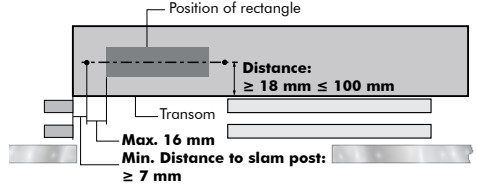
Position of the rectangle in the transom (ride side-opening doors)
